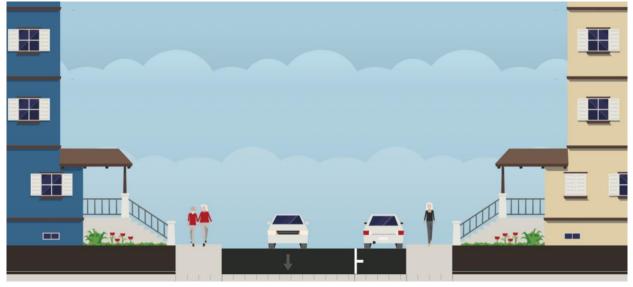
Existing Bader Ln. Cross-section (Streetmix 2023)
